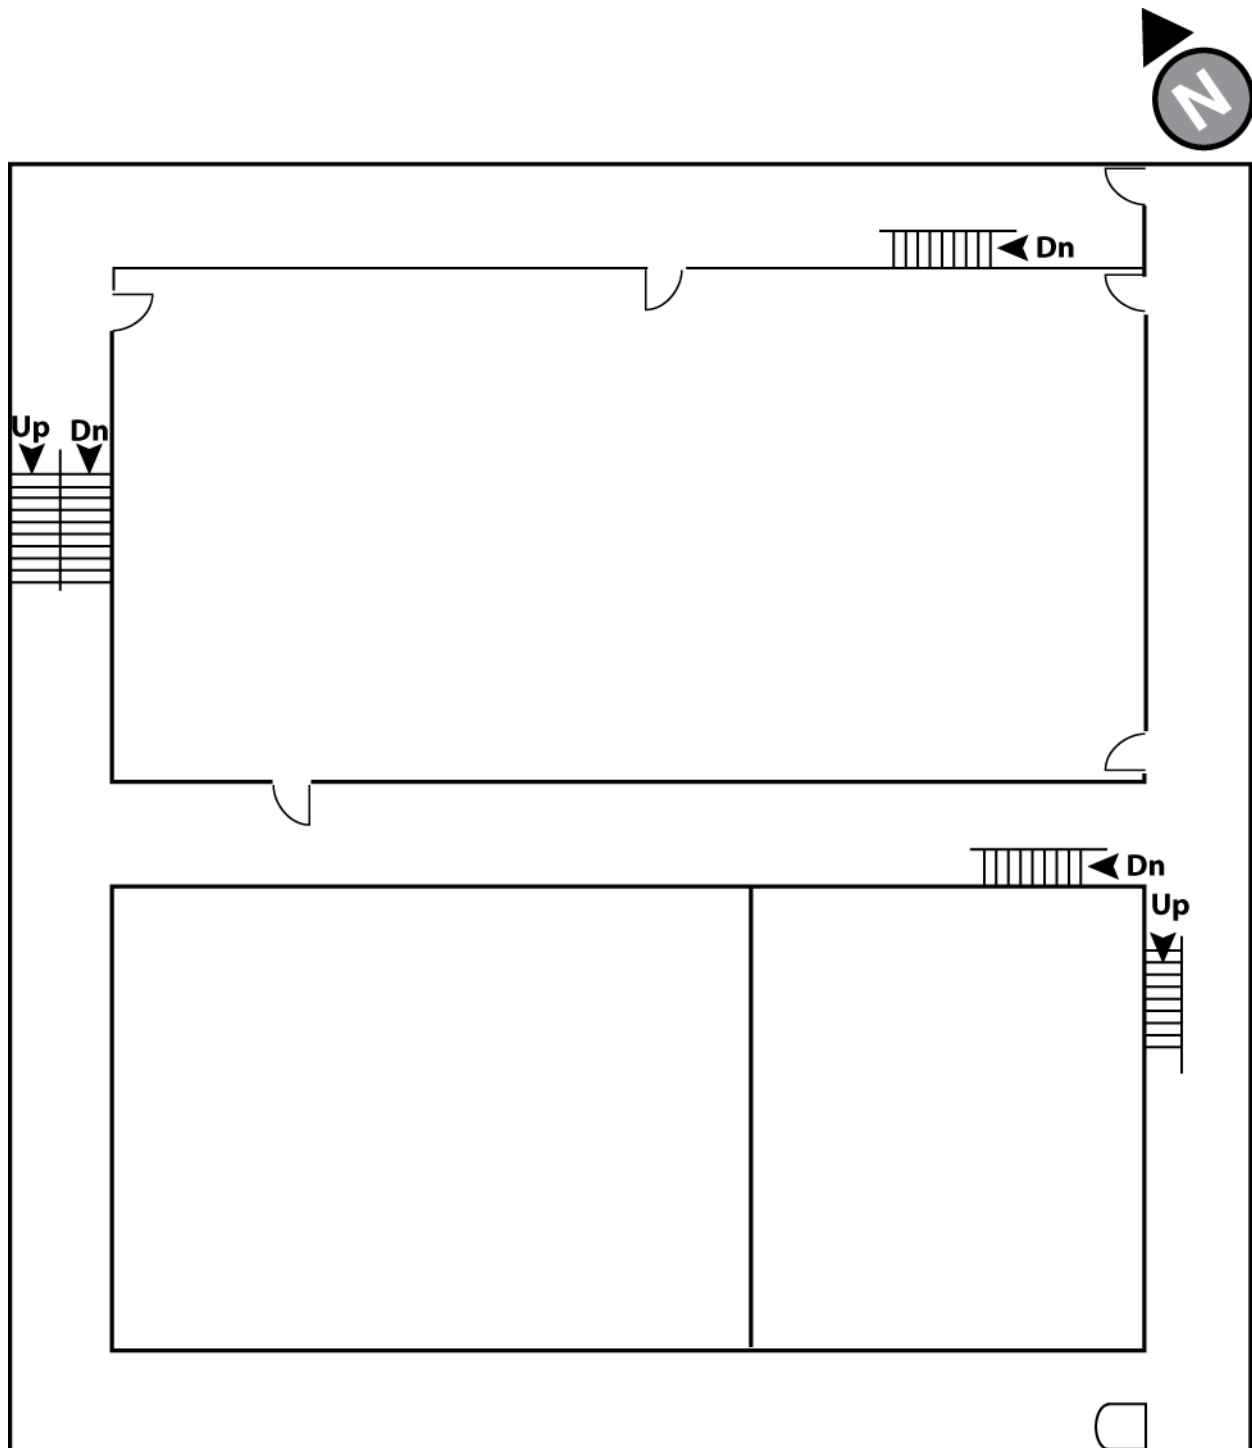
Floor Plan for Building H, Special Projects Building, 2nd Floor
